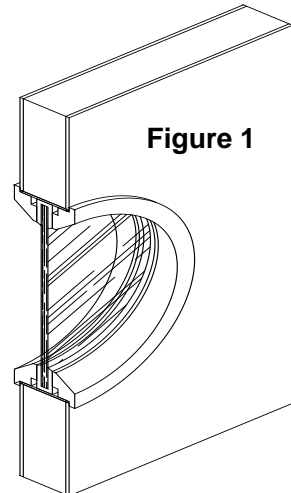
shows a typical arrangement of Lorient System 630 Glazing Gasket in a timber door leaf. The Gasket is to be used with pin or screw fixed retaining beads. Pins shall be a minimum of 50 mm long and screws shall be 45 mm long No 8s, both at a maximum of 85 mm fixing centres.
